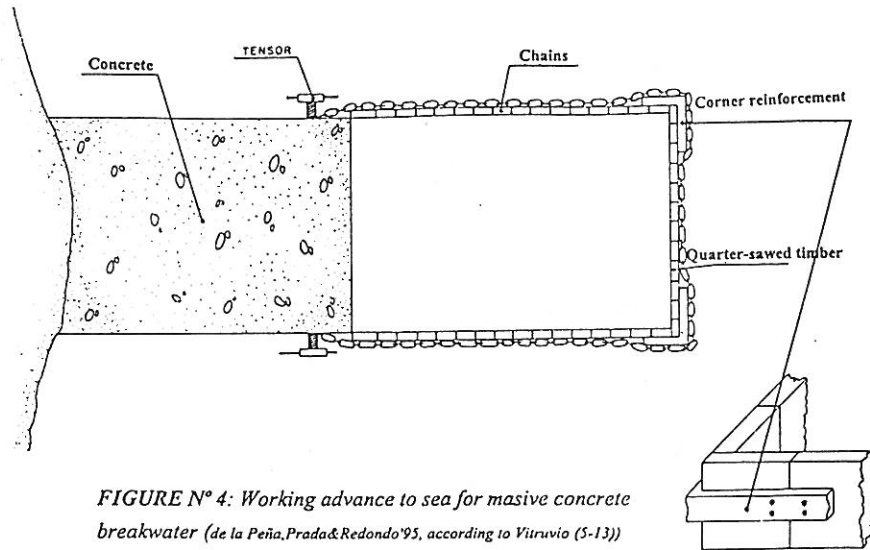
Working advance to sea for massive concrete breakwater (de la Peña, Prada & Redondo '95, according to Vitruvius (5-13))
